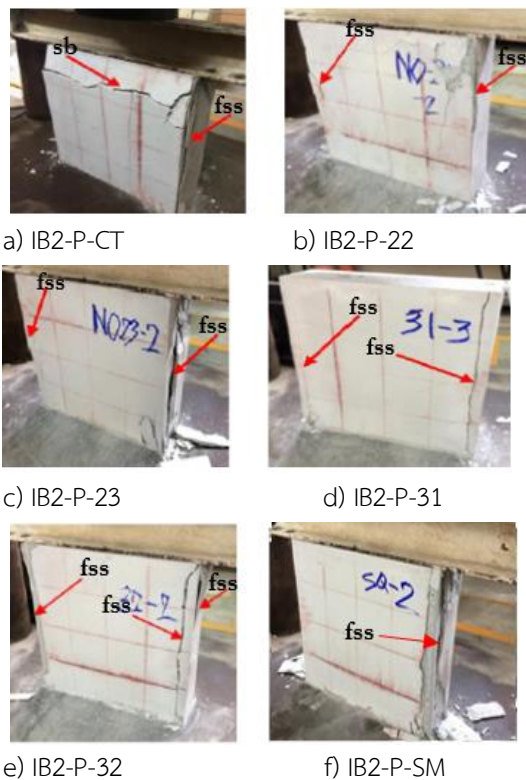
Failure of Concrete Block, CB (Prism test).
